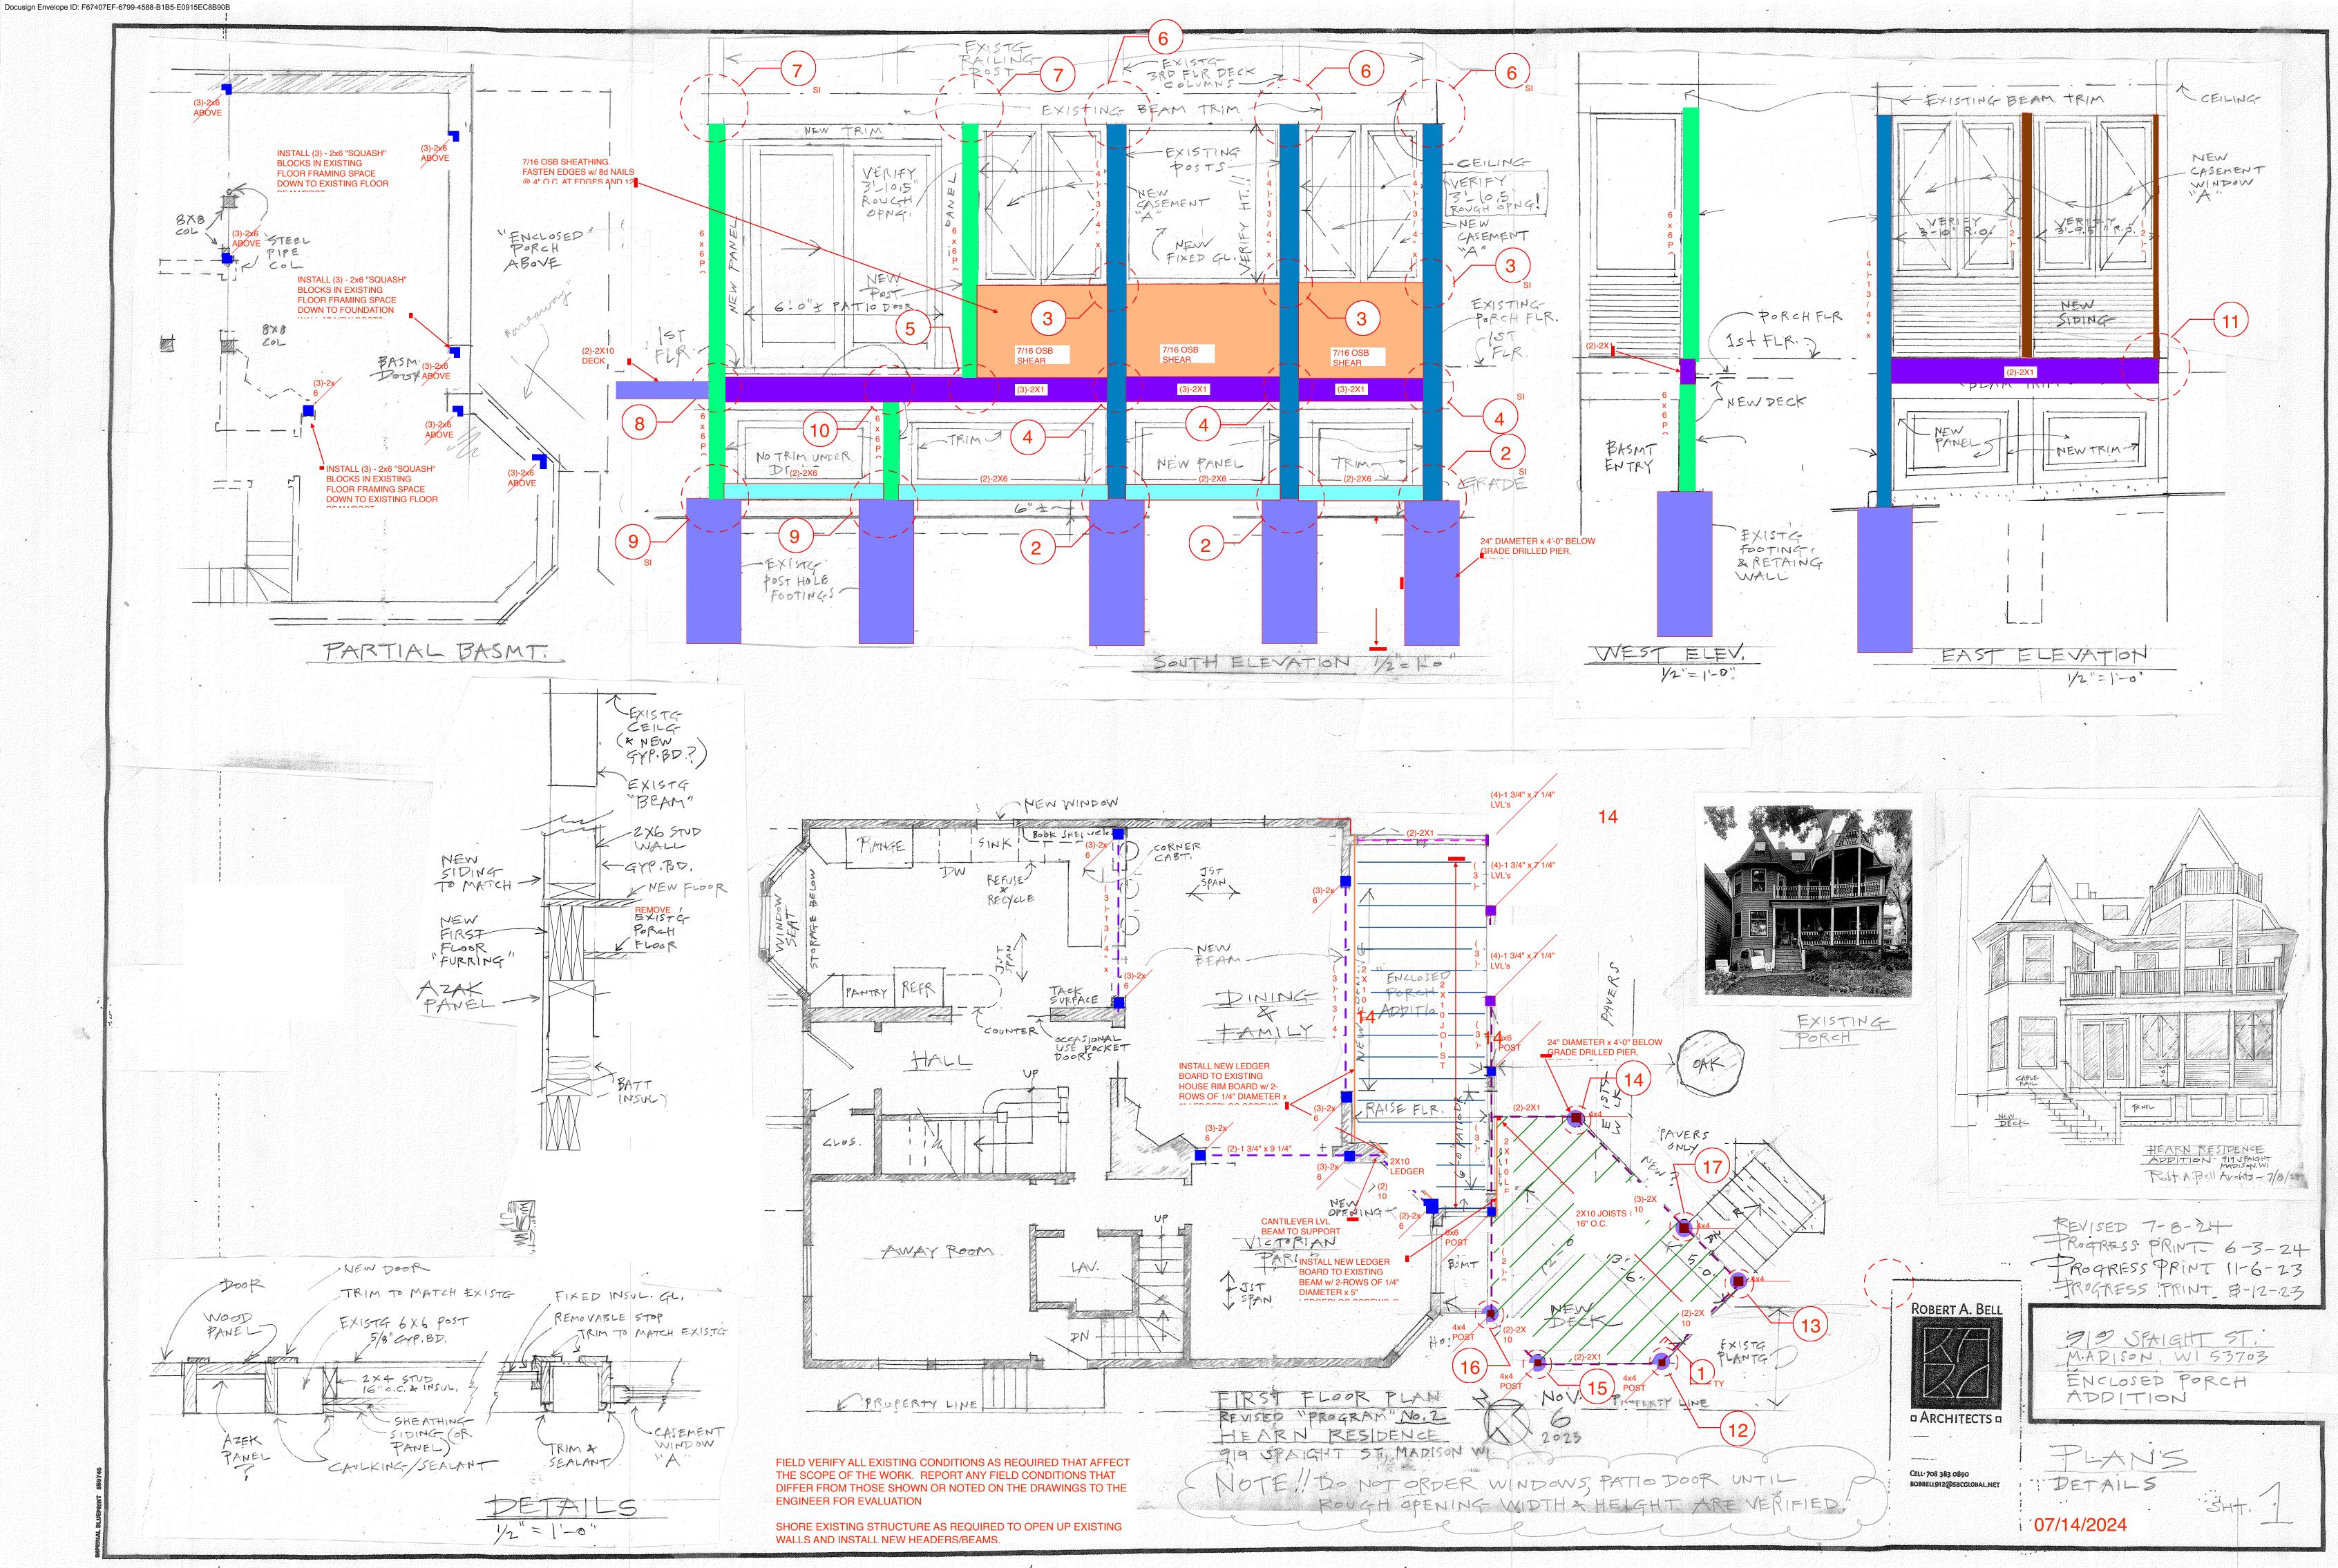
Example of an approved addition including casement windows and sliding doors at 1101 Rutledge St.
